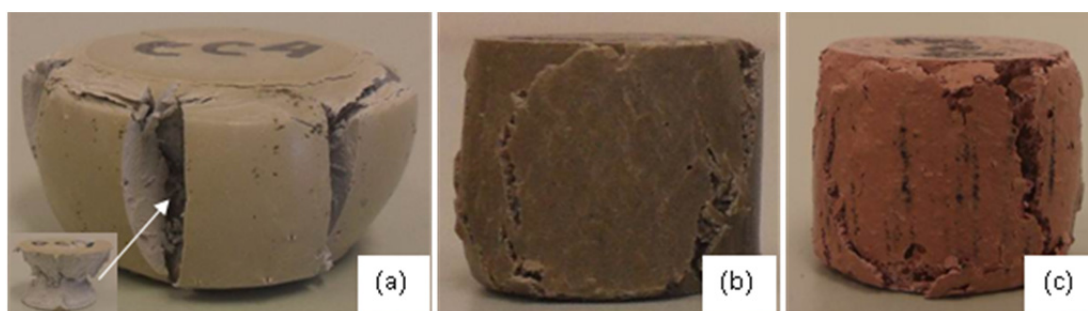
Typical failure patterns of 25 mm cylindrical specimens under compression; (a) grout C, (b) grout D and (c) grout E
